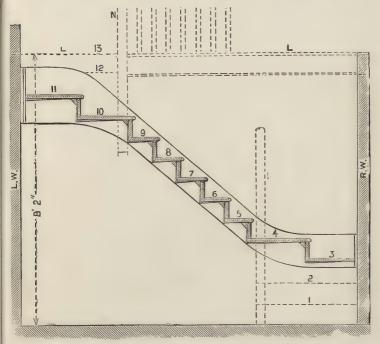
Sectional Elevation of Staircase with Winders top and bottom.
